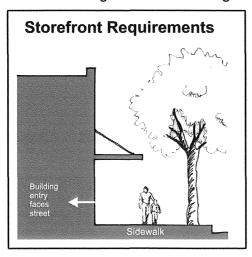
Building incorporating weather protection and storefront windows along a primary pedestrian façade.
